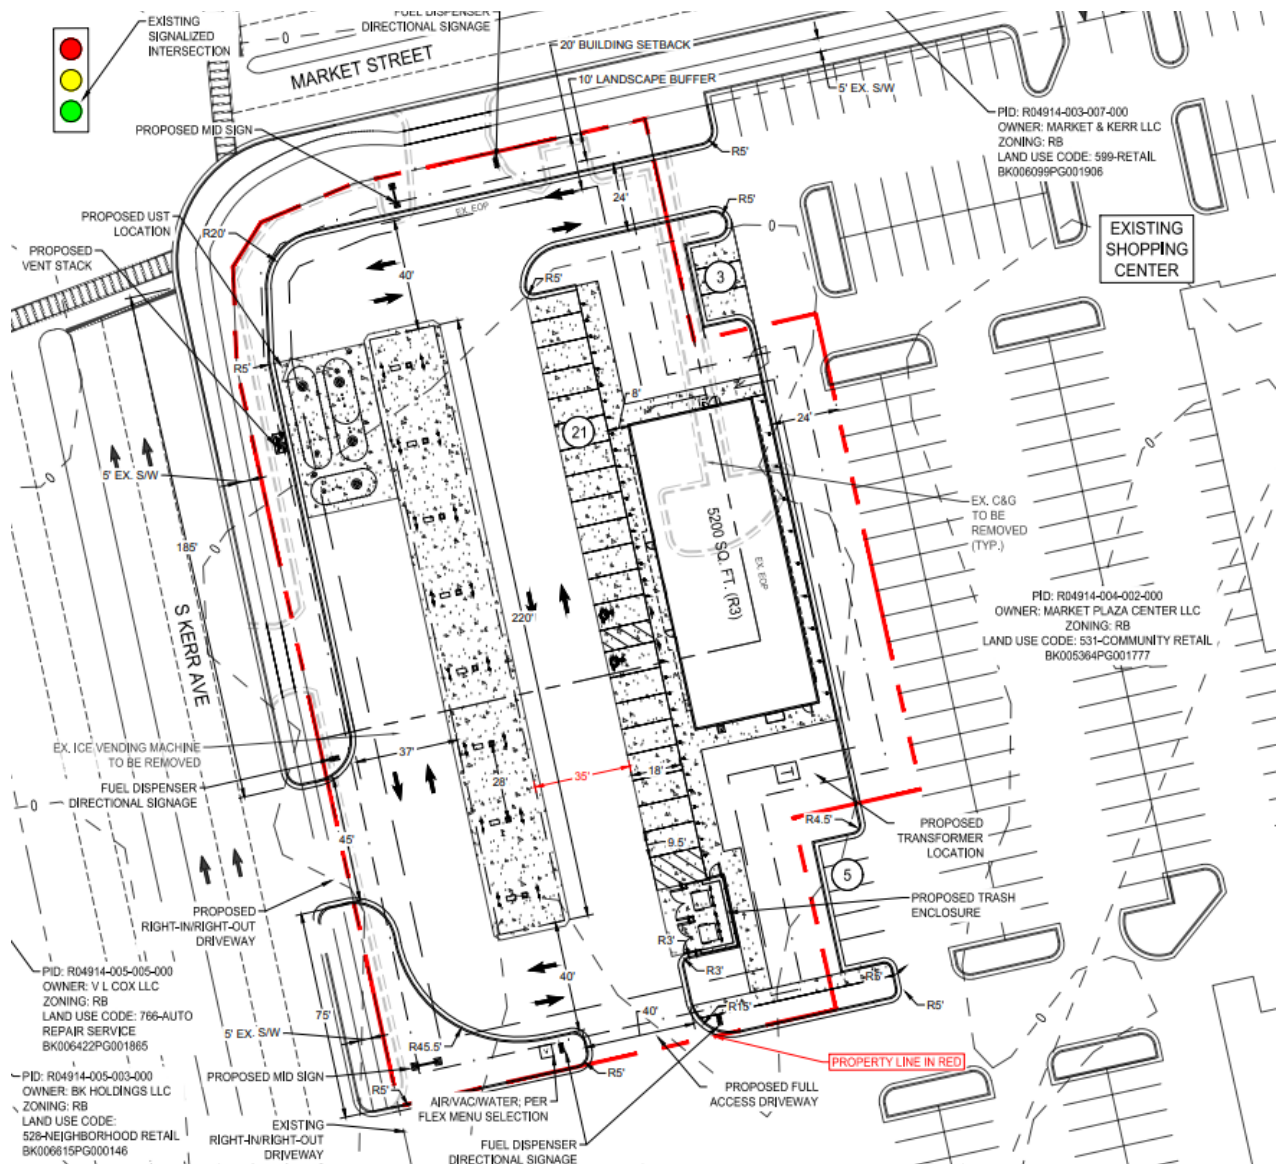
Site Plan (Attachment 4- updated for 10/16/24 hearing)
